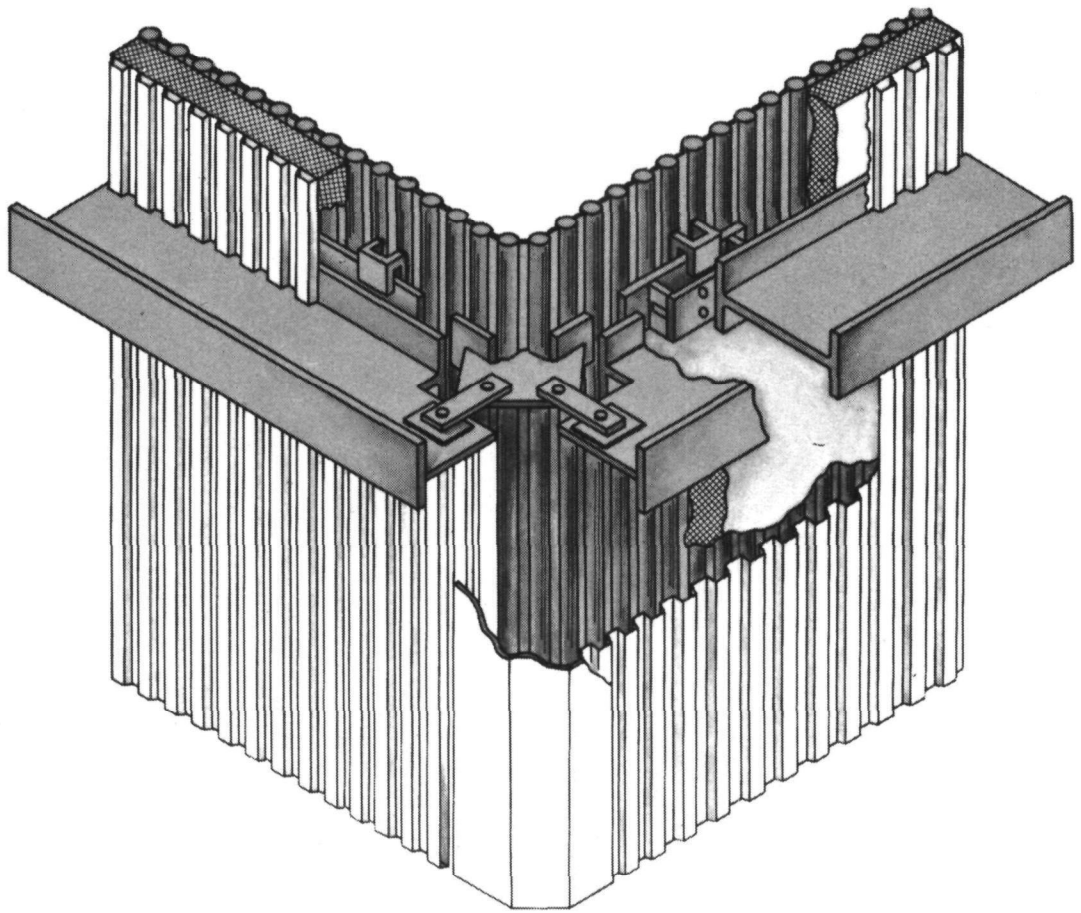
TYPICAL EMPLACEMENT OF WELDED PANEL-WALL
